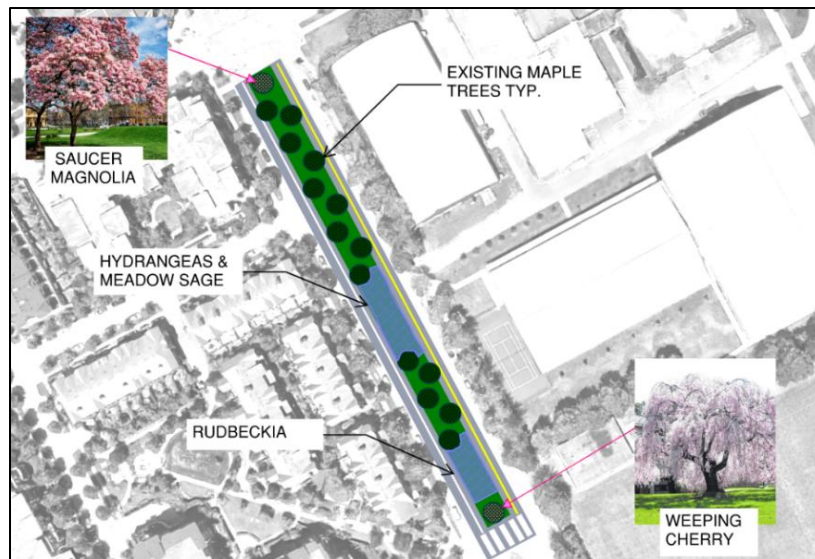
Greenspace Plan from Thunderbird Blvd to Eagles Dr.
